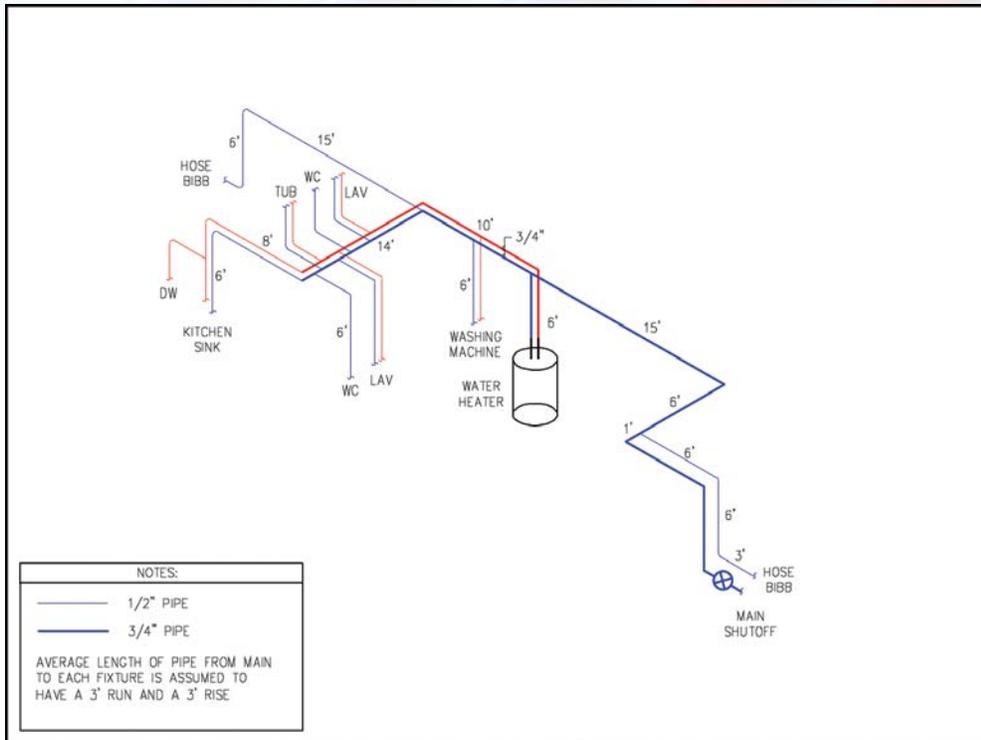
Trunk and Branch Isometric Riser for the Townhouse
